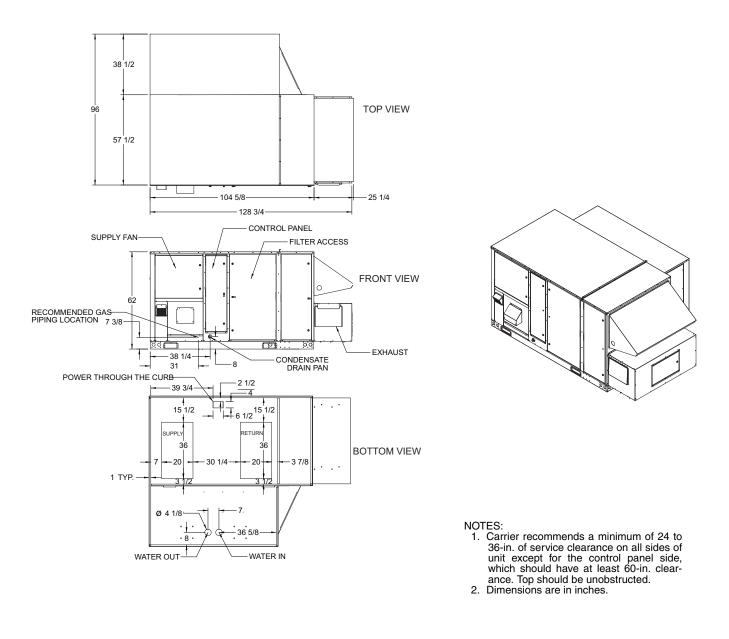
Unit Dimensions — 62RC,RD12-20 Units with Optional Exhaust
